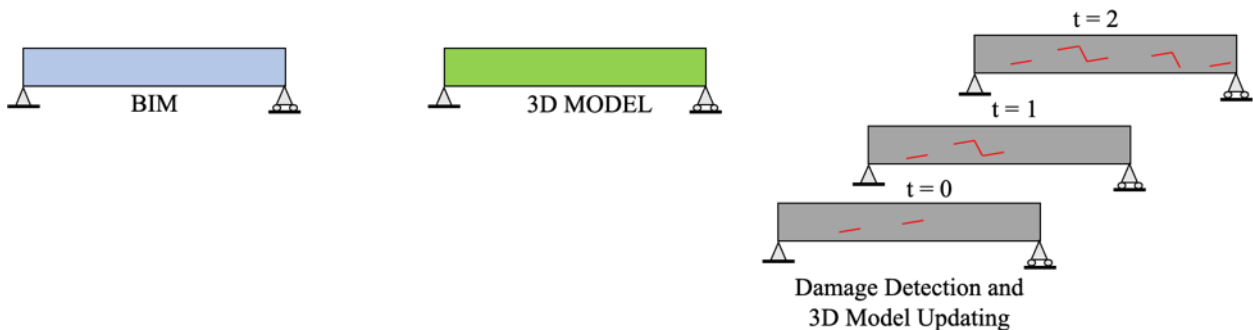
Bridge 3D Model Damage Segmentation Proposed Concept
